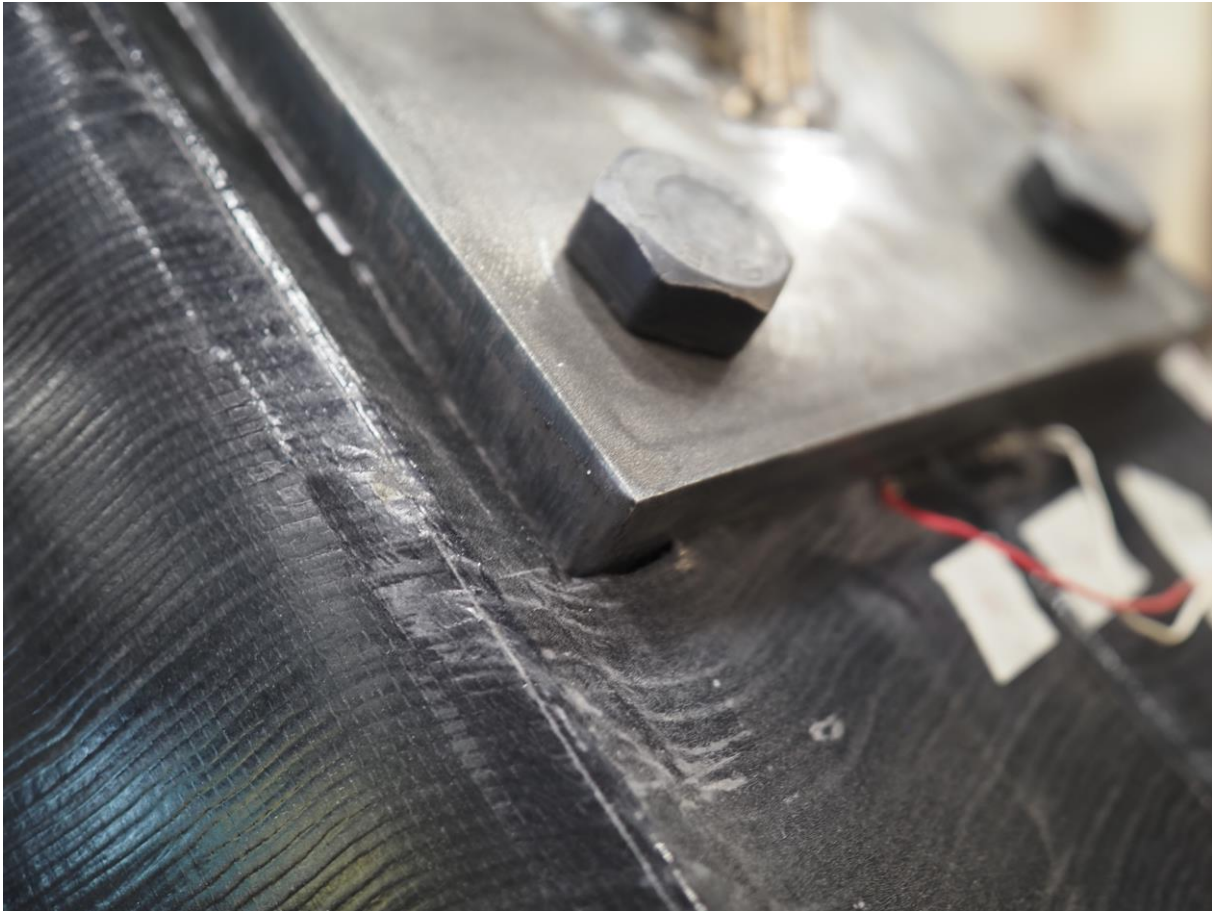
First Failure anchor type 1 - soft wood filler plate
